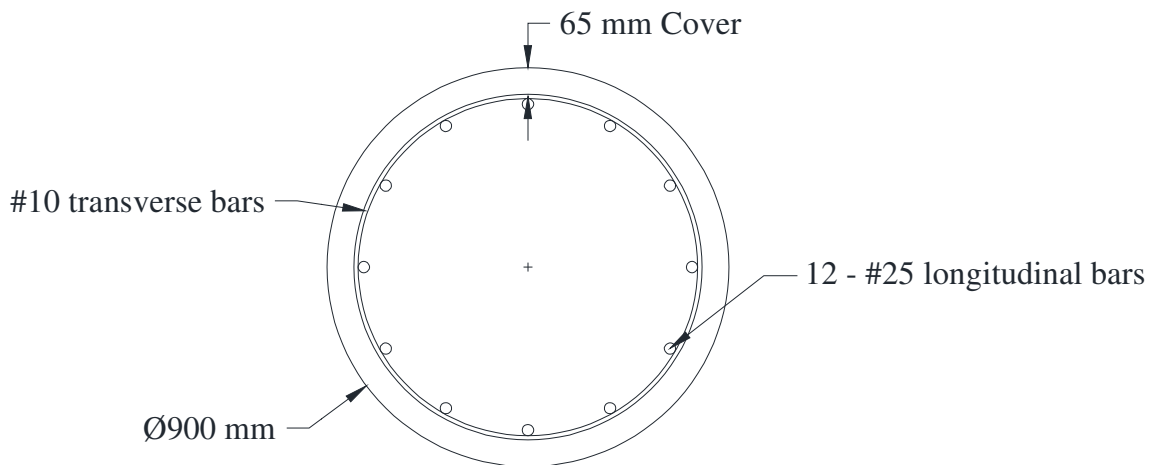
Cross sectional layout of 900 mm diameter bridge pier
